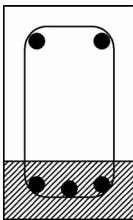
Cross section of steel reinforced ECC/concrete composite beam
